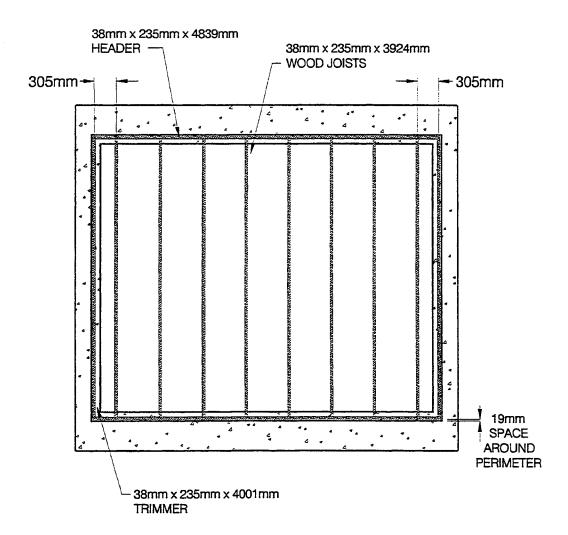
Layout for joists 610 mm o.c with joists symmetrically disposed about the midline of the floor opening (10 joists).
